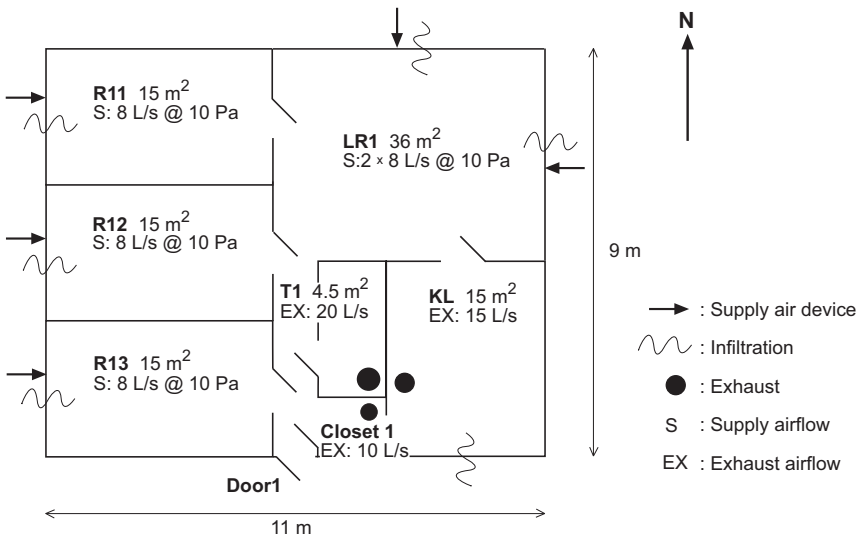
shows the apartment at floor one, where R12 is room 2 at floor 1, LR1 is living room at floor 1, K1 is kitchen at floor 1, T1 is bathroom at floor 1 and Door1 is the door between the apartment at floor 1 and the staircase. Every floor consisted of an identical apartment. There was no internal leakage between the rooms and no leakage through the roof.
